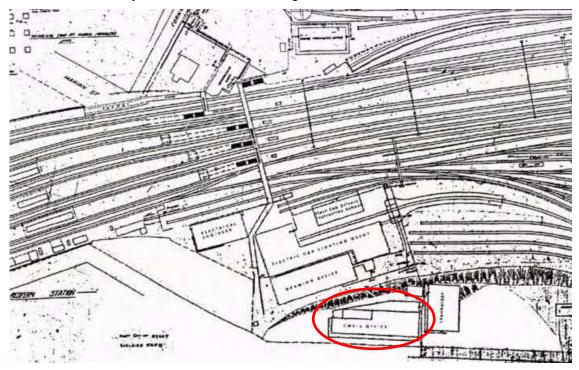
Undated early layout of the Eveleigh Railway yard showing CME building, connection to the Workmen's footbridge (circled) and Redfern Station (the drawings Office, the Electrical Car Lighting Depot, the Testing Laboratory and the rails) (Rappoport, 1997)
